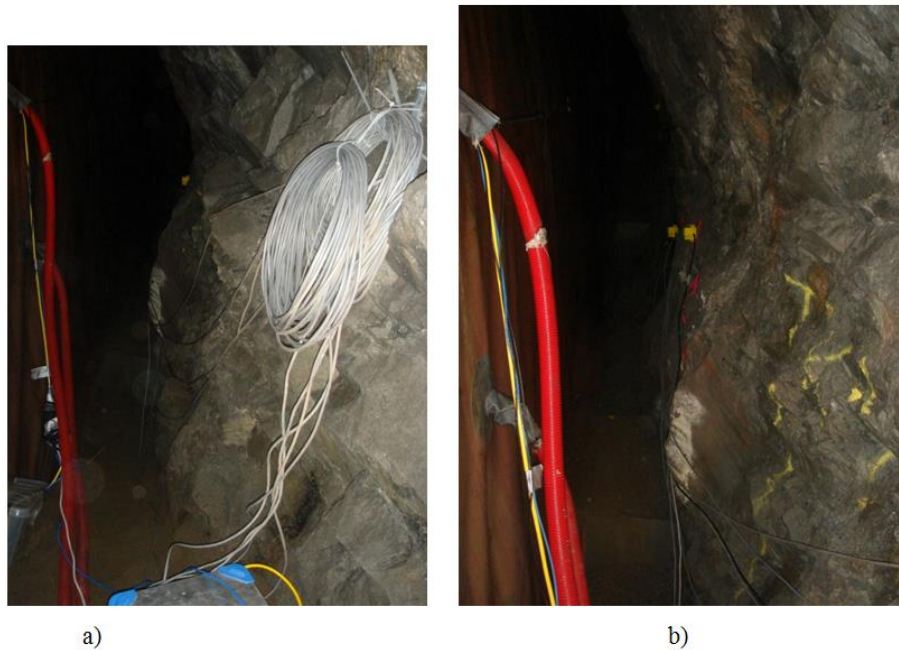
Photographs of the Oslofjord tunnel wall where the system was instrumented showing high undulation of the rock wall.
